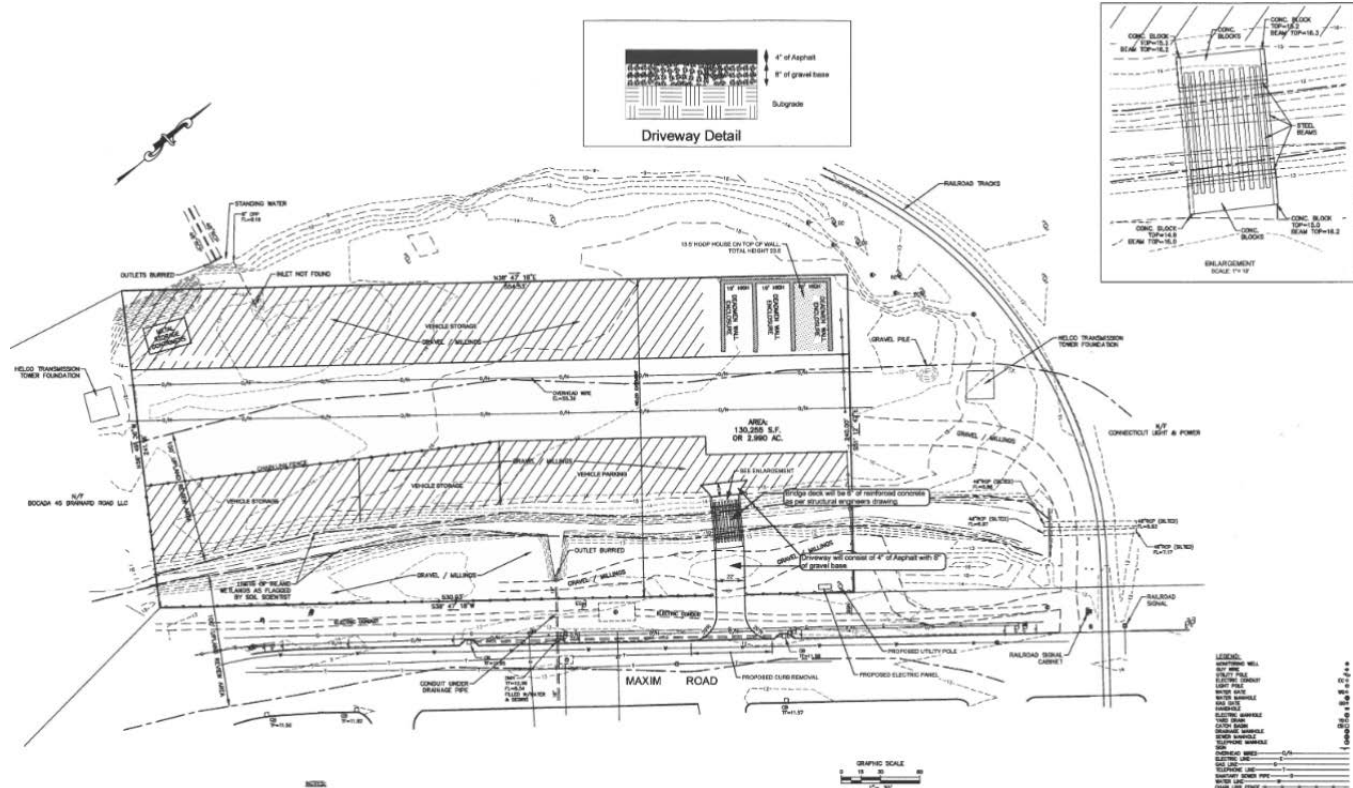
Proposed Site Plan. Existing (off-site) driveway is to the right, on property owned by Eversource. The proposed driveway and bridge are to be approximately 225 ft. away.
